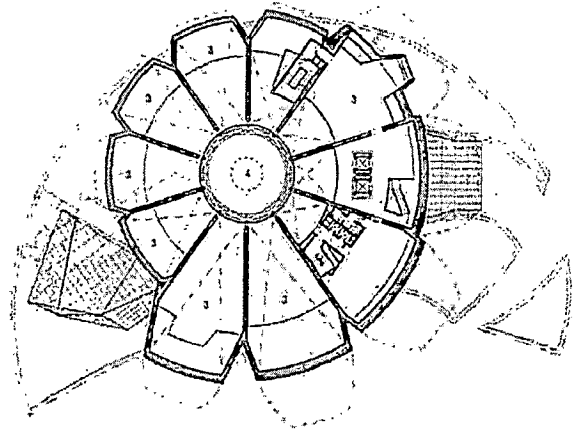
Fourth Floor Plan (SAFDIE, Moshe, 2011)
